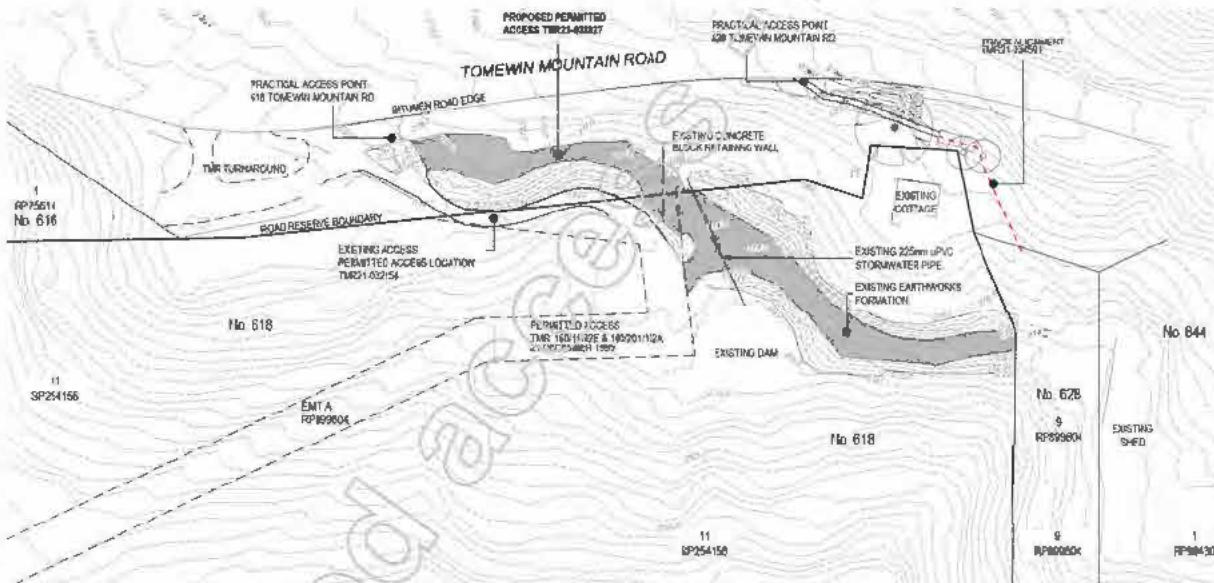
Existing accesses between Lot 11 SP254156 and Tomewin Mountain Road (TMR) (source: Existing Site Features Layout Plan, Pacific Civil Engineers, PCE-23-010 Dwg 002 Rev B)
